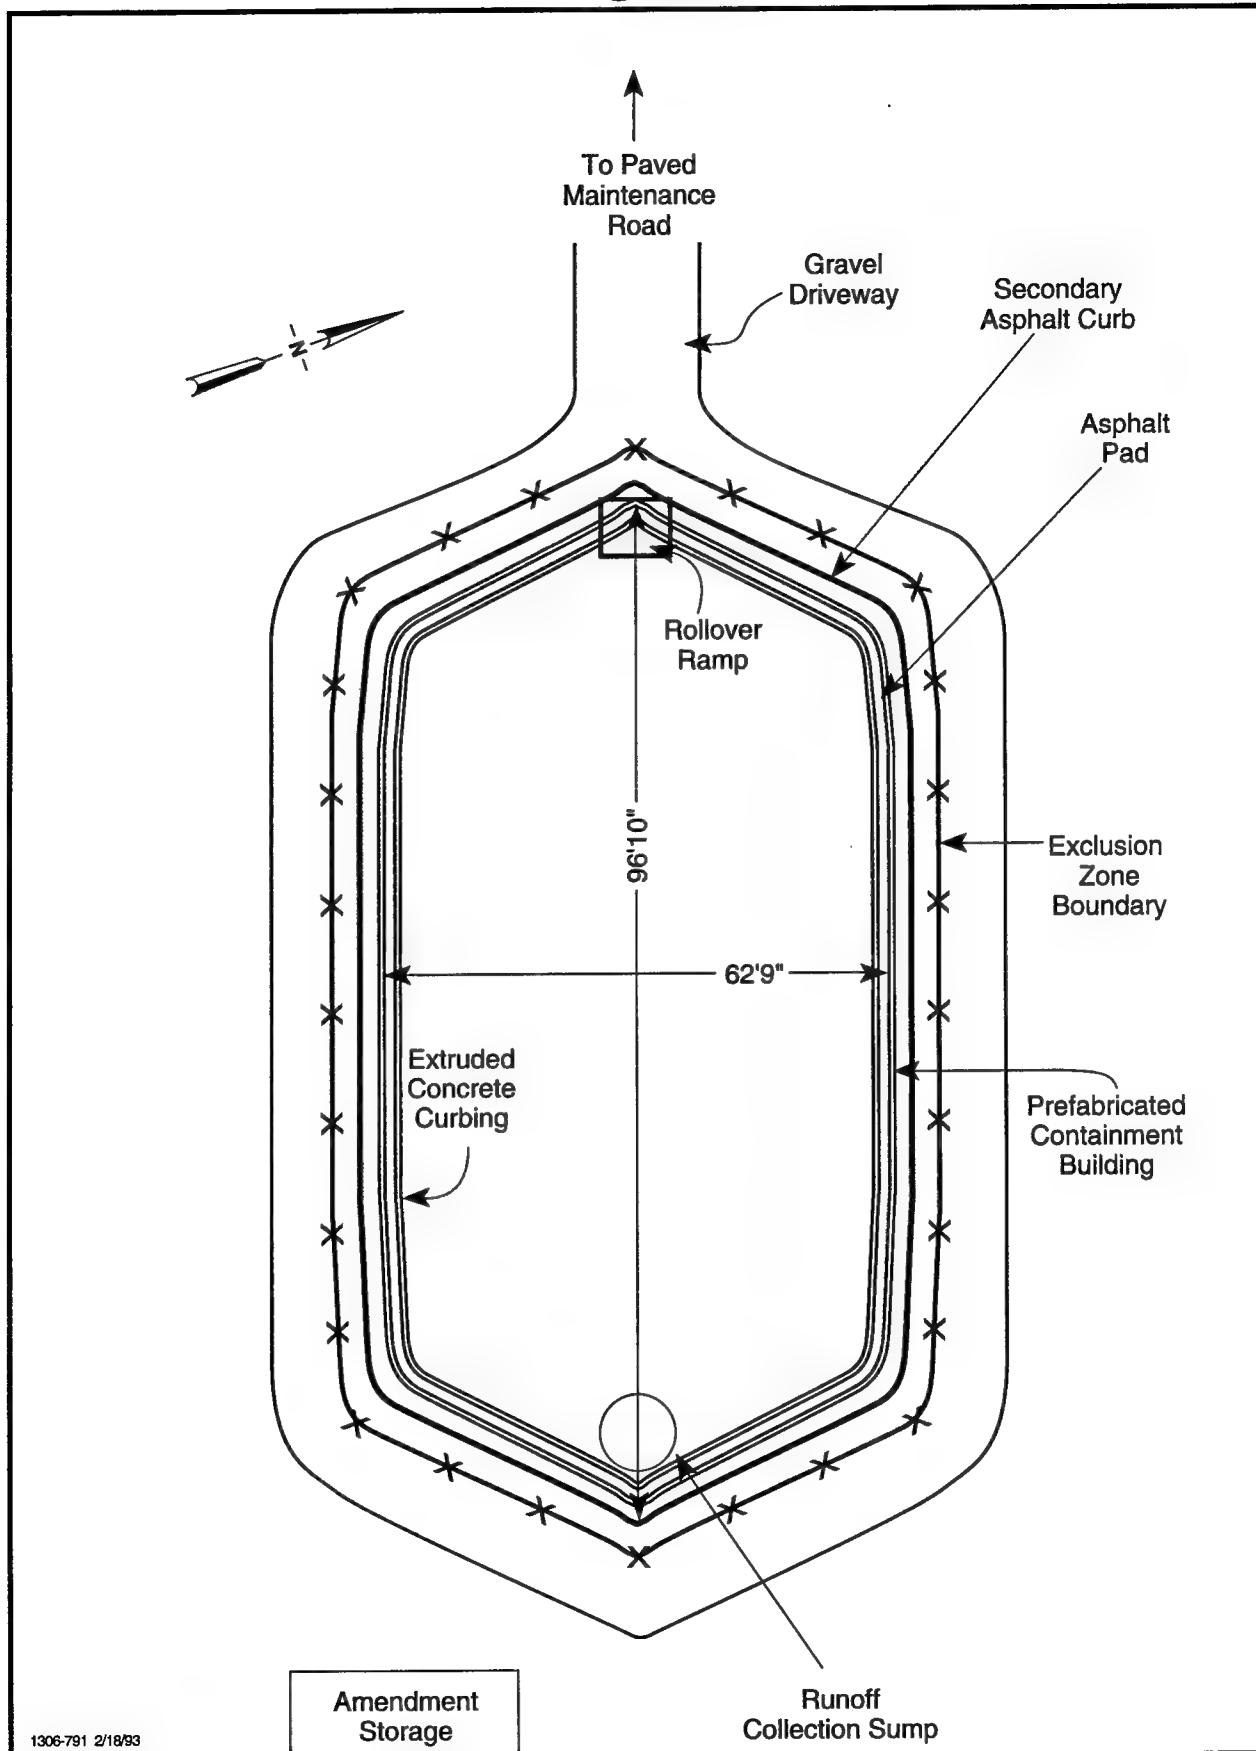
CONTAMINATED WINDROWS SITE LAYOUT
